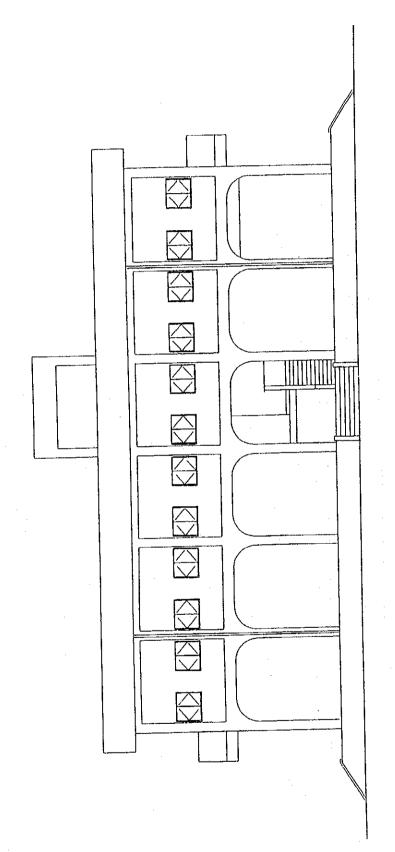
(4) ELEVATION (4-CLASROOM TYPE)
